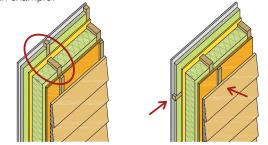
Improving of airborne sound insulation parameters on the exterior wall from original 42 dB (left) to 49 dB:
